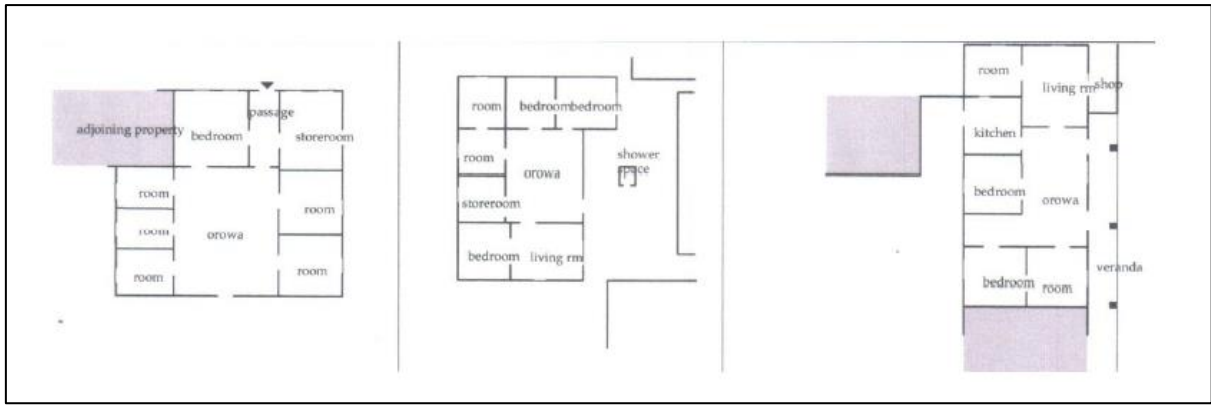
Floor plans of the Orowa variant of the traditional compound house; source: Adekoun (2013).
